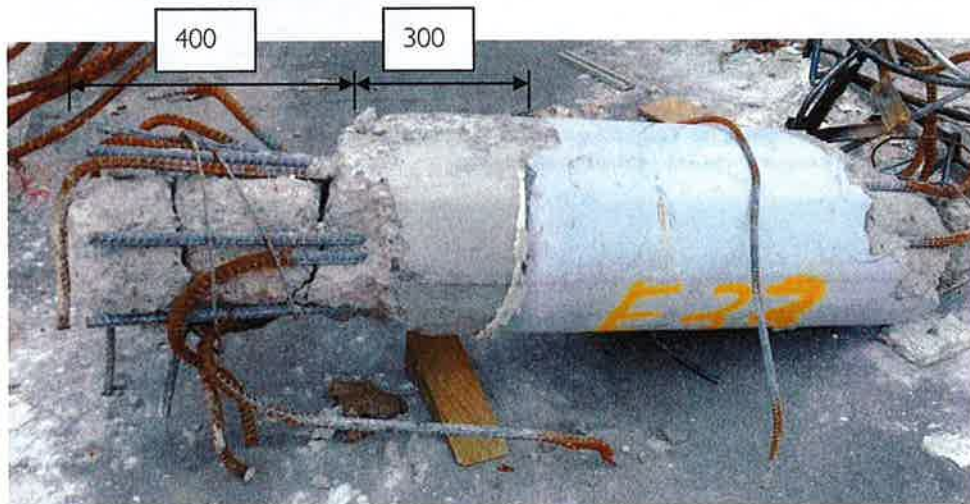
400 Diameter Exterior Column Item E33. (DENG C5 or C11, Dwg S15). Left end is bottom of column at floor level with concrete spalling over lapped vertical reinforcing. Horizontal cracking in core confined by R6 spiral which had fractured. The unpainted portion was protected by Spandrel Panels.. Right-hand end fracture occurred below beam-column joint.
